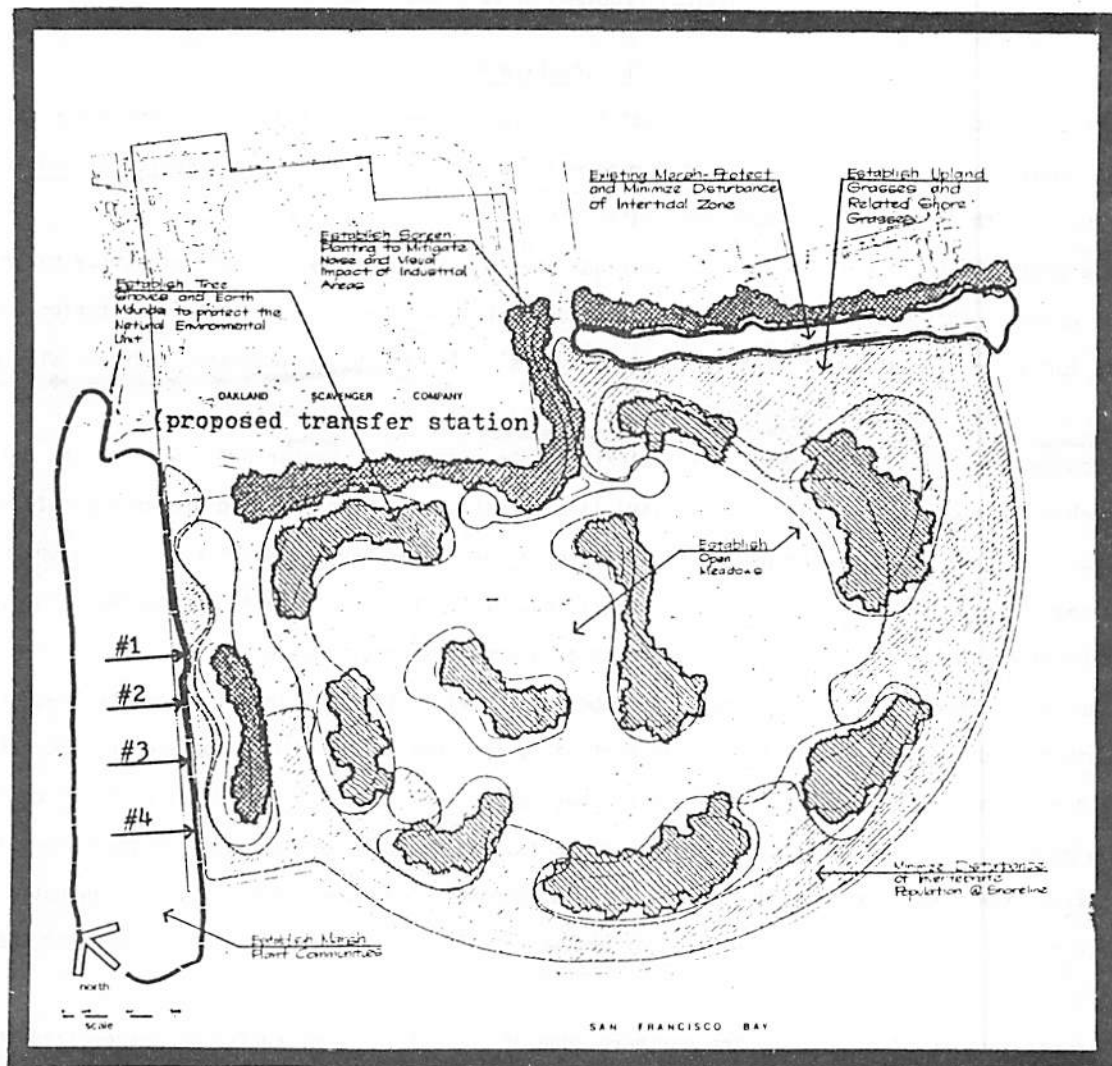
Site Plan (locations #1 - #4 indicate leaks)
